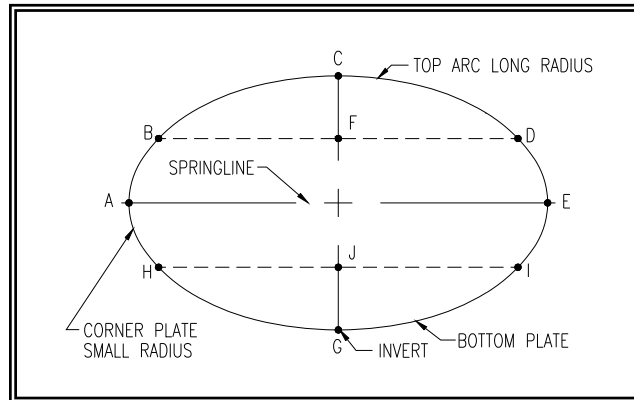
Horizontal Ellipse Long-Span Culvert
